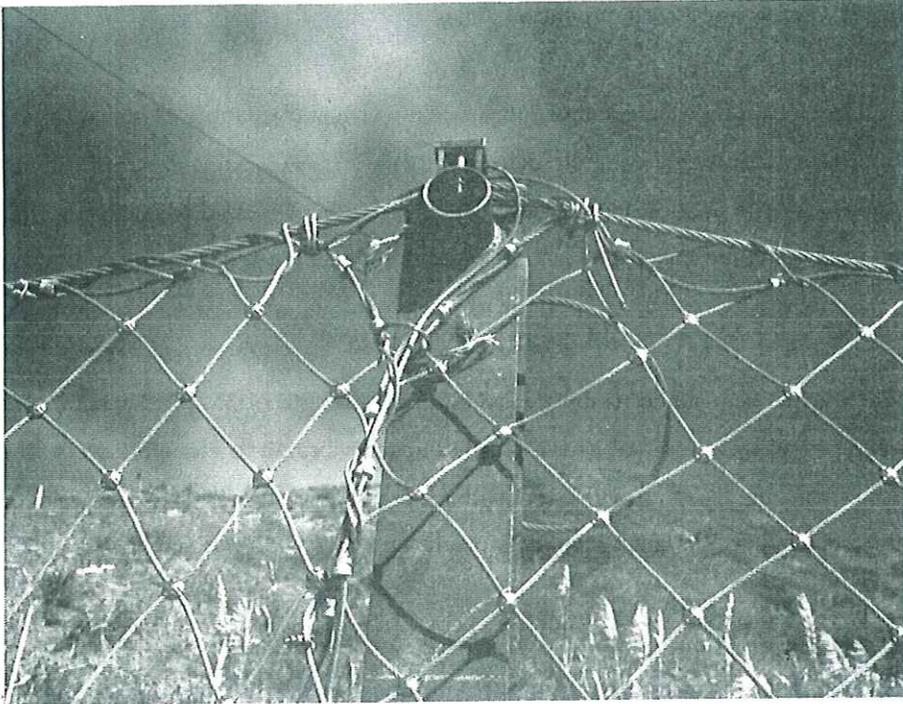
DETAIL OF A BRUGG POST WITH MACHINED FITTINGS SUPPORTING THE PERIMETER WIRE ROPE
